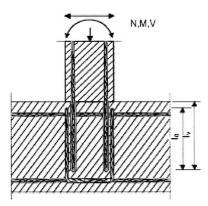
Overlap joint at a foundation of a column or wall where the rebar is stressed in tension
